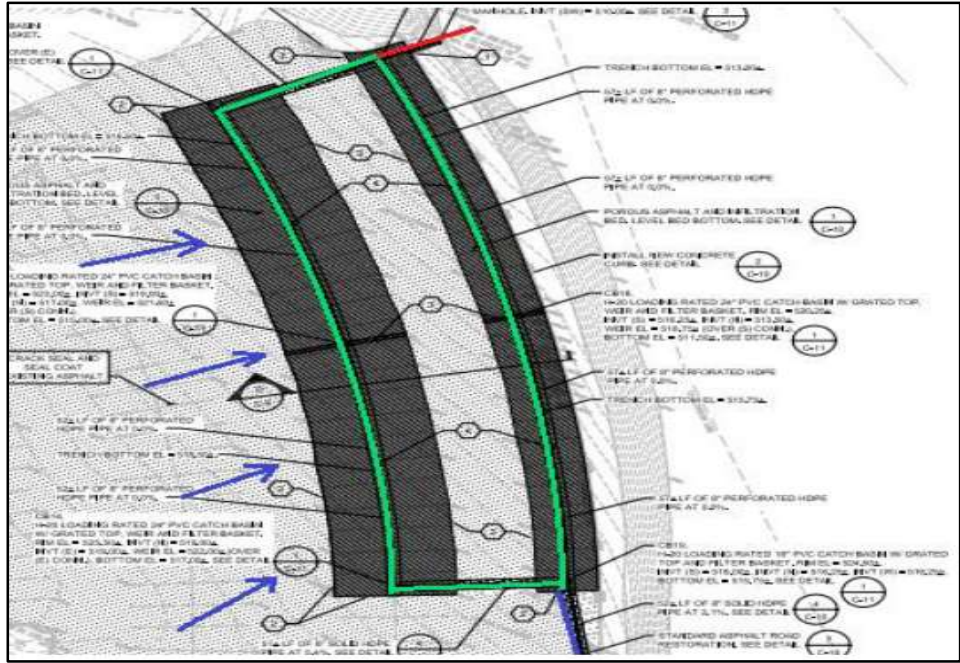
Plan View for Zoo Elephant Lot NE Permeable Pavement
